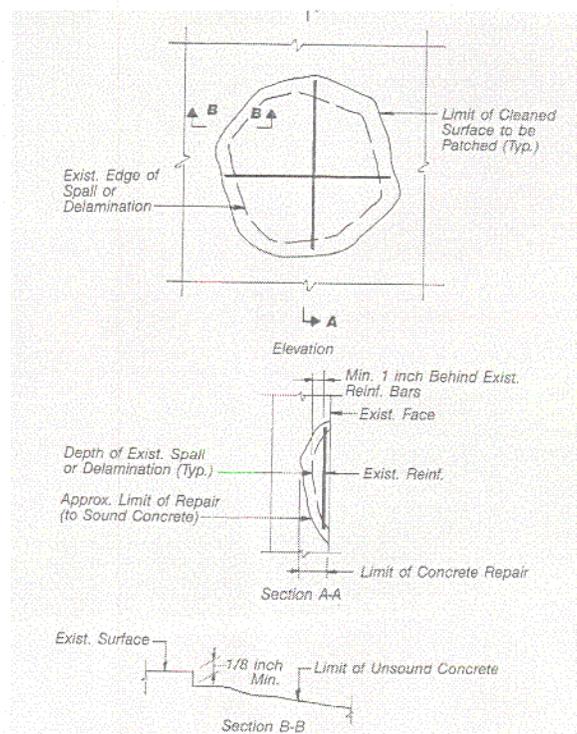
Typical Concrete Spall Repair – showing surface preparation
